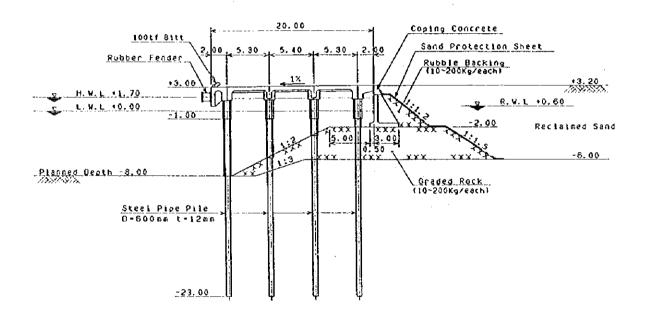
(1) Typical Cross Section of Quaywall E1,E2(Open Pier with Retaining Wall)
